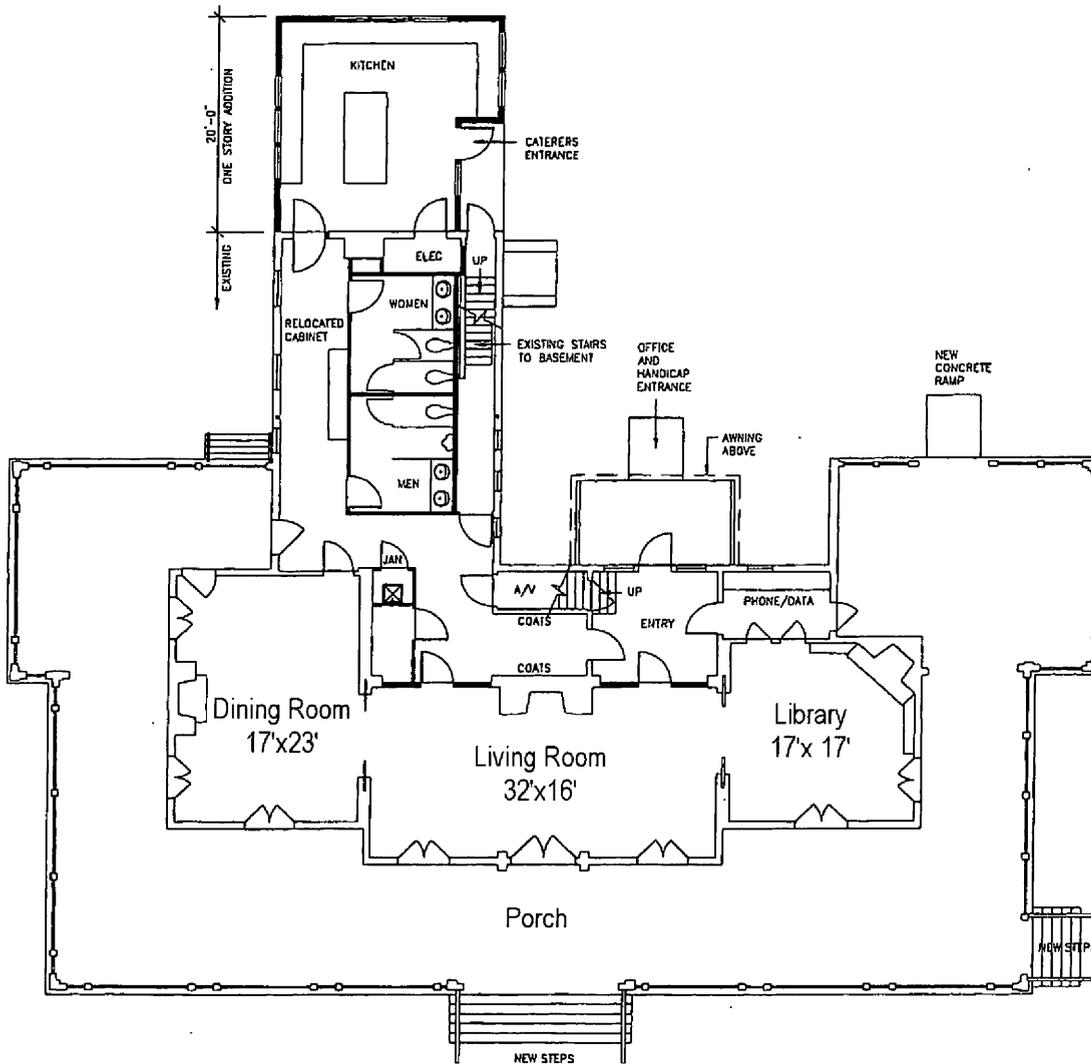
Krippendorf Lodge Renovations, First Floor Plan,
